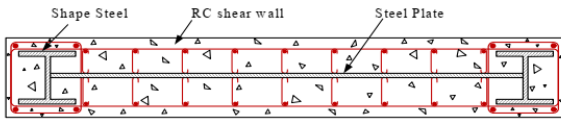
Steel Plate Reinforced Concrete Composite Shear Wall (SPRC) (Xiao et. al., 2012)
